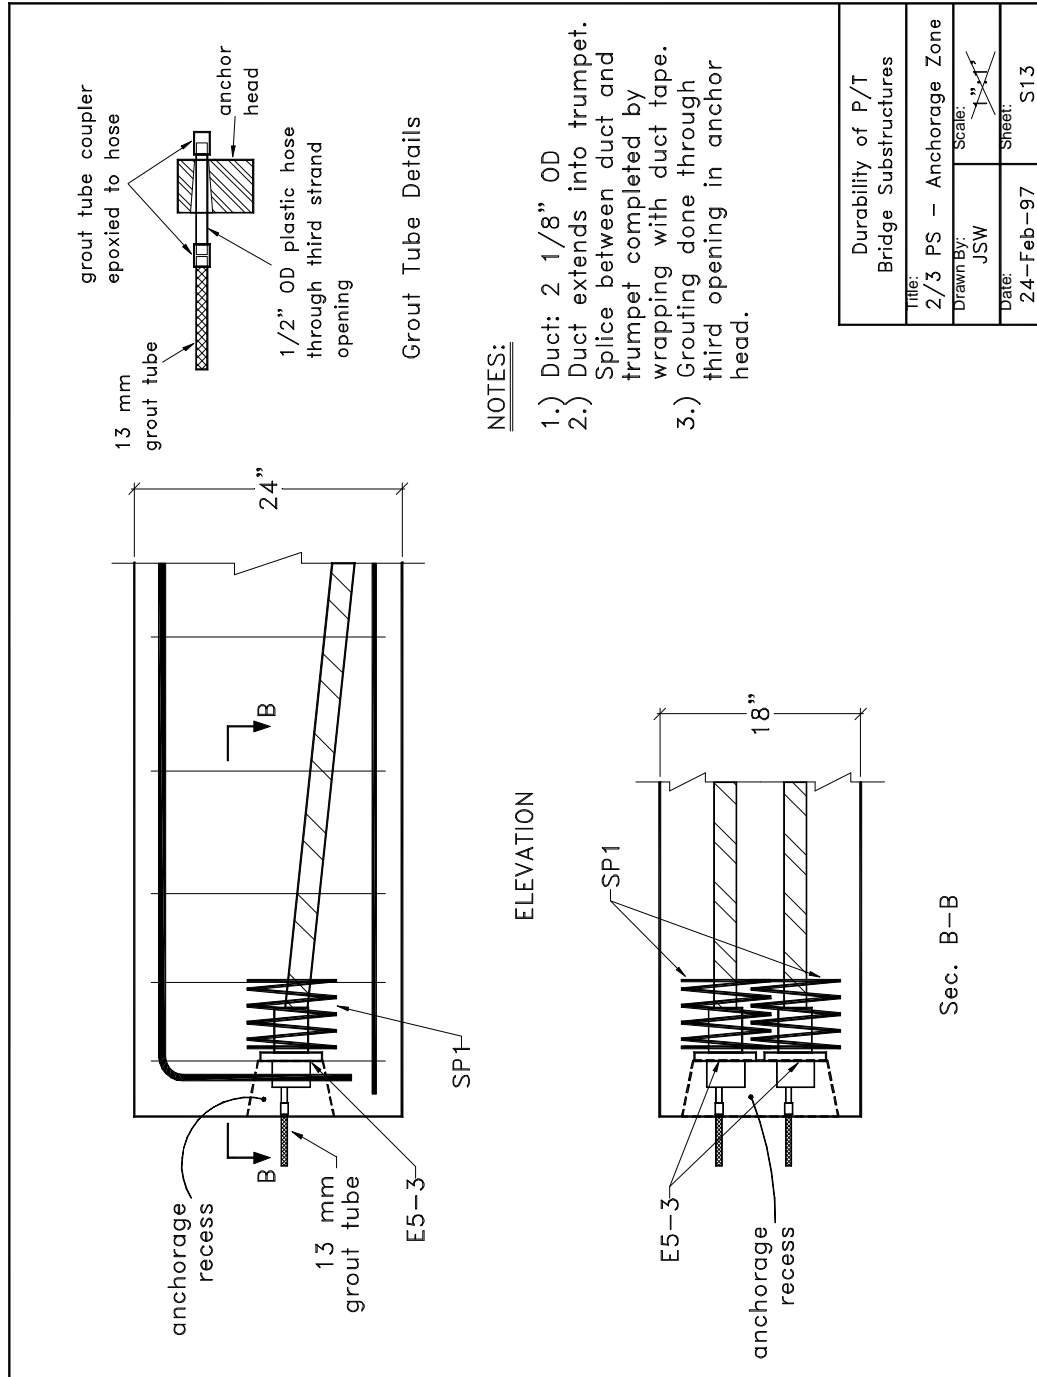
Sheet S13: 2/3 PS Anchorage Zone
